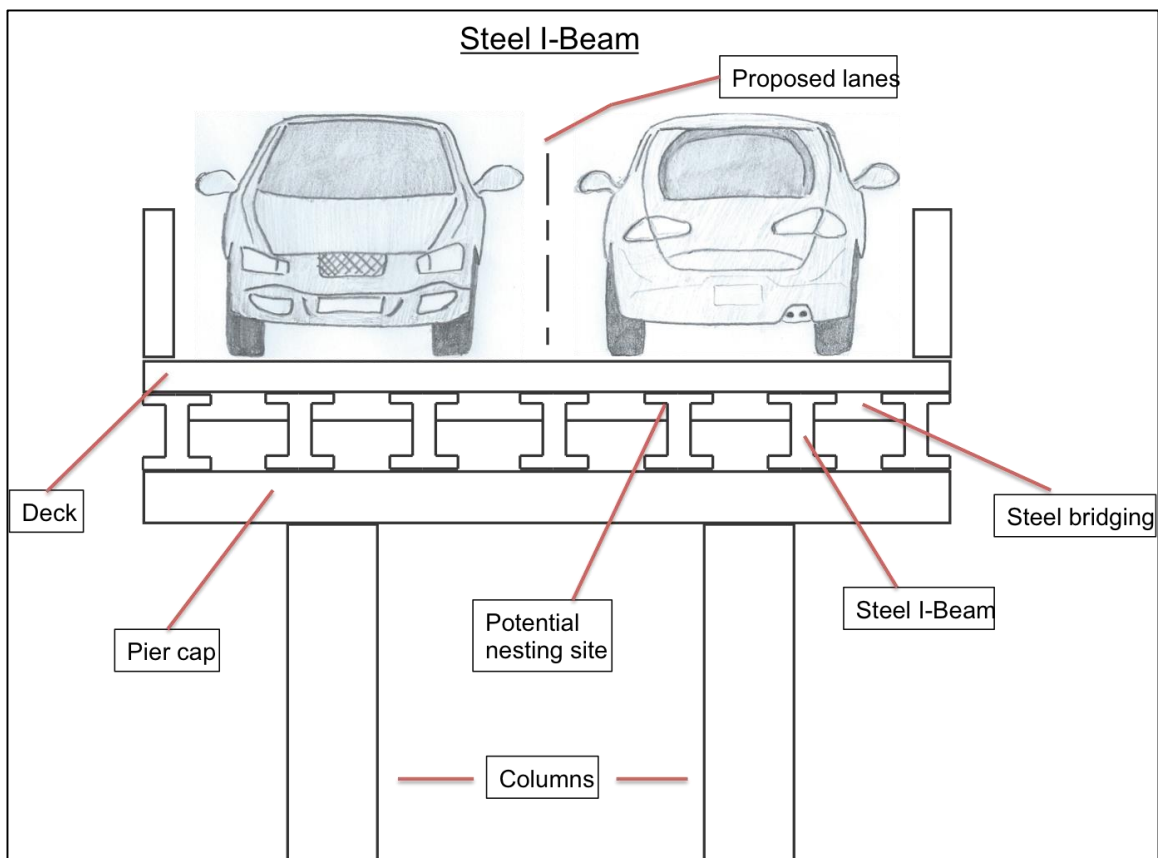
Cross-section of a steel I-beam bridge with potential nesting site
